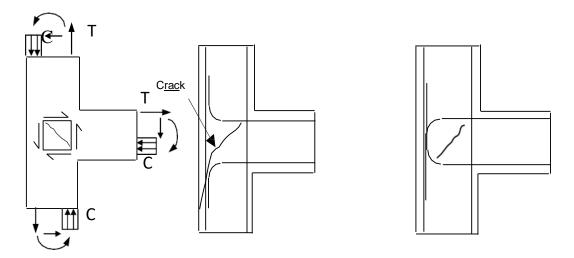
(a) Forces in exterior joint (b) poor anchorages (c) Satisfactory anchorage
